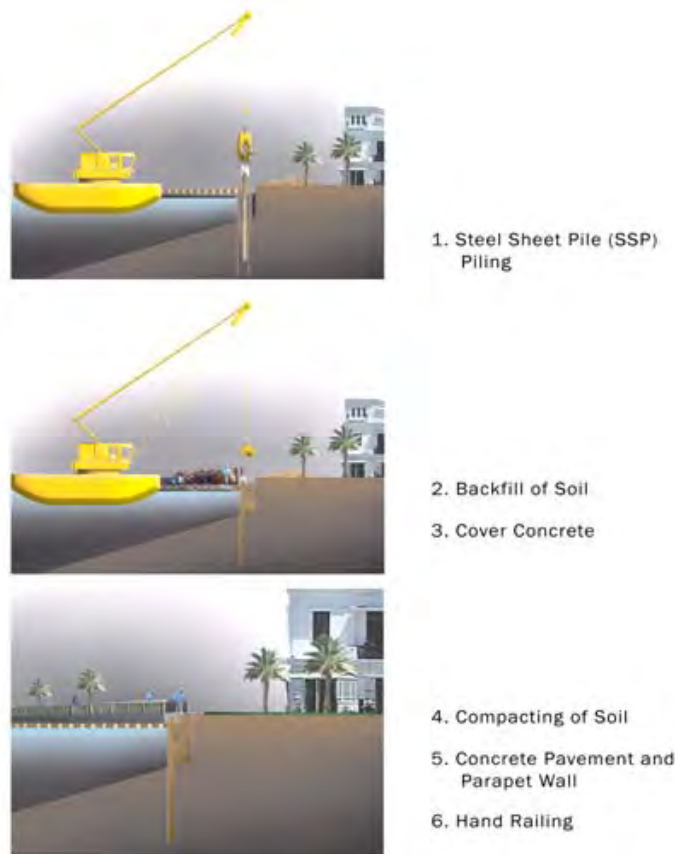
Construction Procedure of SSP+IW+IP Type Revetment
